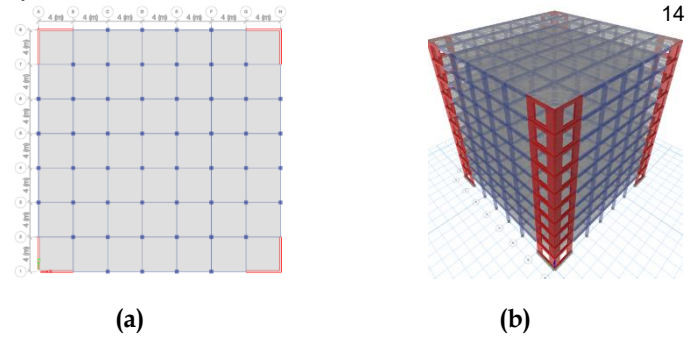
(a) Plan and (b) 3D model of CSW placed at corner
